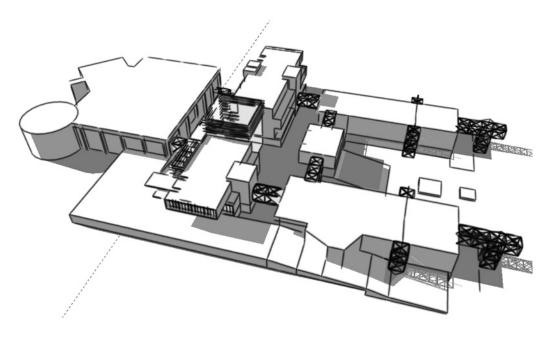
Scenario H.2: Structural connection to Civic Center, looking west.
